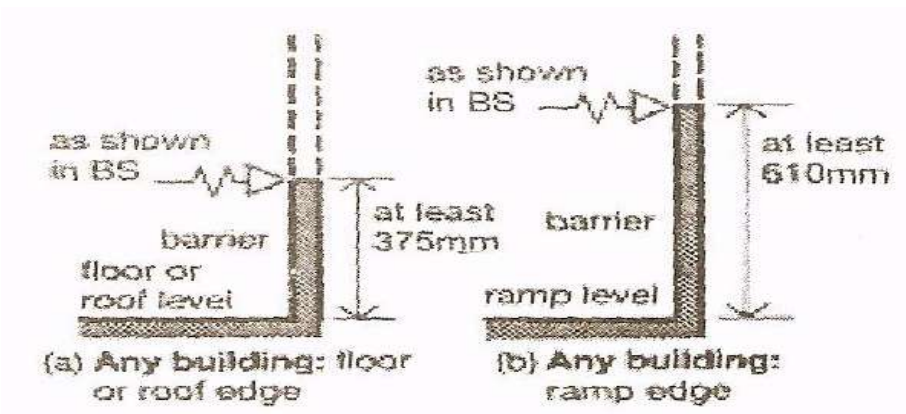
Typical Locations for ContainmentMM - 15.1 Vehicle Barriers
